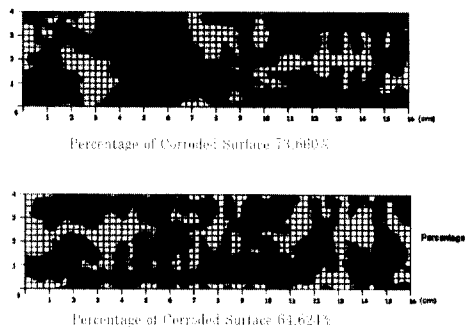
Corroded Surface Area for Reinforcement Steel in Concrete Specimens Labelled in NS6
